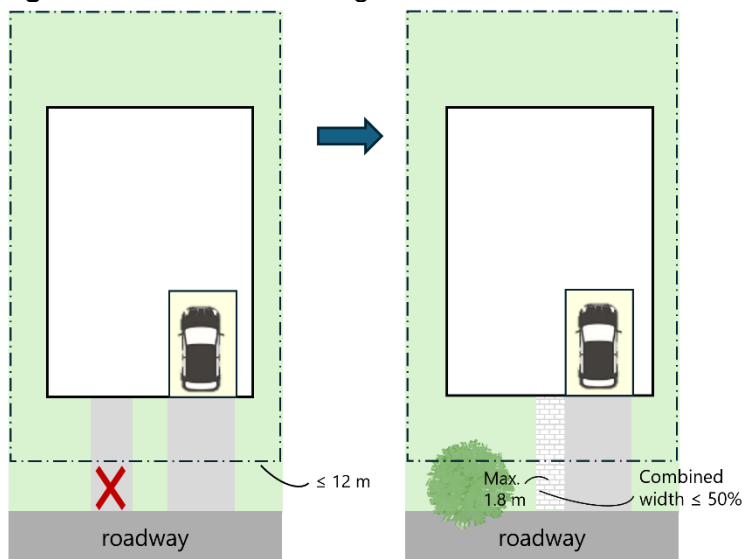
Lots with a frontage 12.0 metres wide or less with an existing driveway
